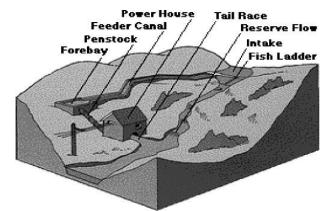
Typical Layout of a Small Hydropower Plant. Source: Hydro Power www.fae.sk/Dieret/Hydro/hydro.html
